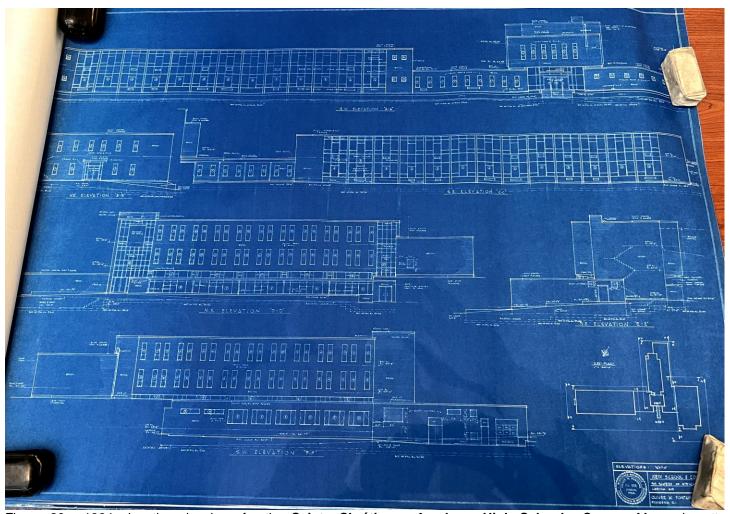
1964 elevation drawings for the Sainte Chrétienne Academy High School. Source: Massachusetts Archives, Division of Inspection, Building Inspection Plans.
